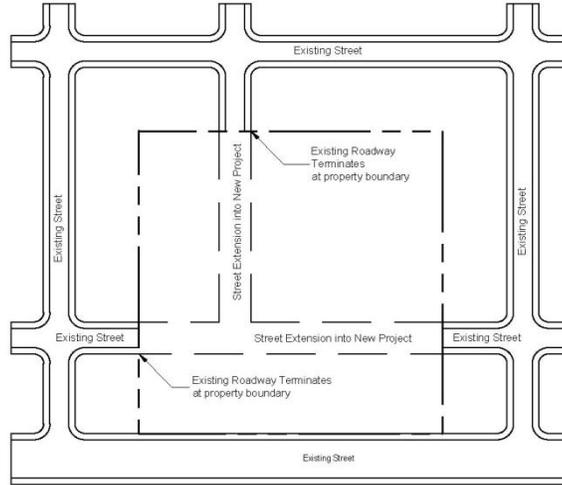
(a).1 – Site Layout – Street Extensions into New Projects/Developments
